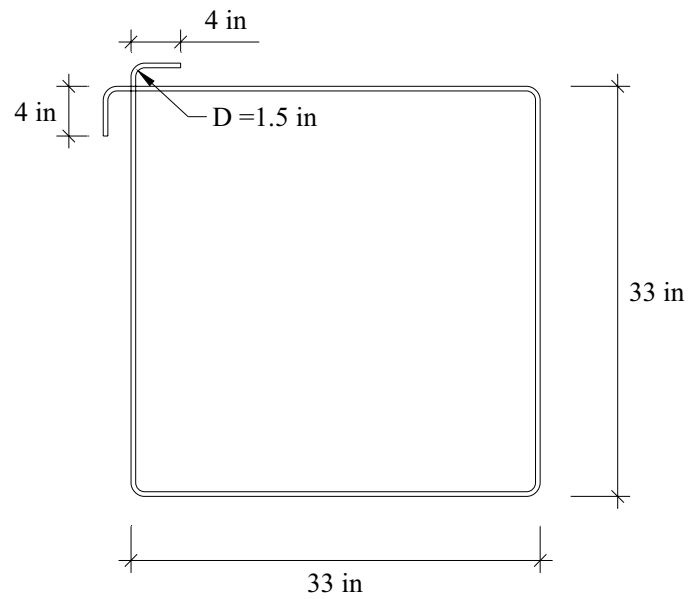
Section A-A; Tie #3 Detail; Specimens G1 & G2
